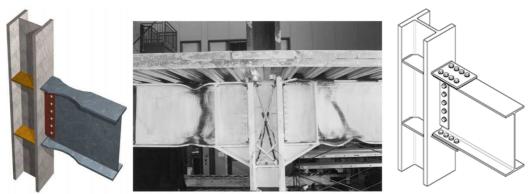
(a) Reduced Beam Section (RBS) connection [Crawford, 2002], (b) Welded haunch connection [Uang et al, 2000], (c) bolted brackets
